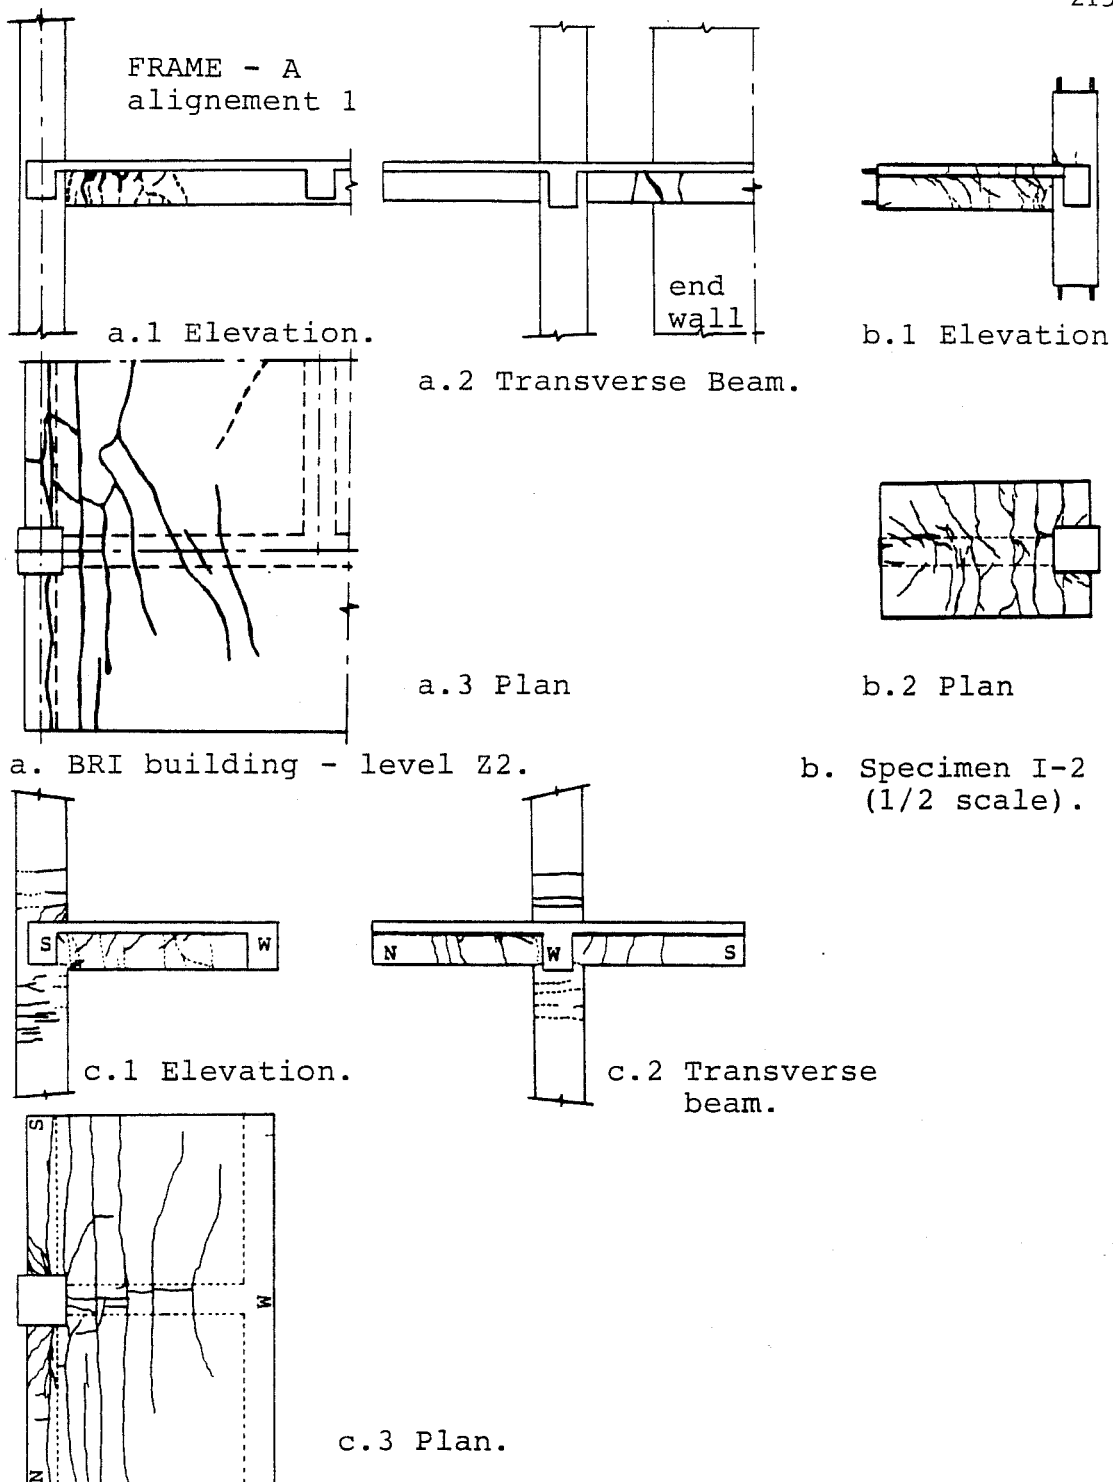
Cracking Patterns in Building and Exterior Tests.
